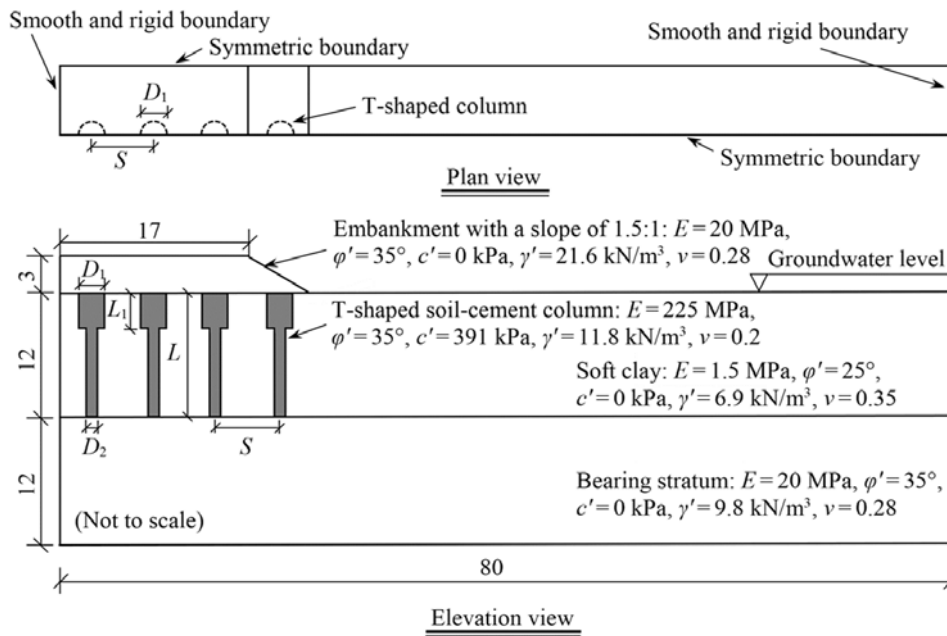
Schematics of a T-shaped soil-cement column supported embankment (unit: m).
